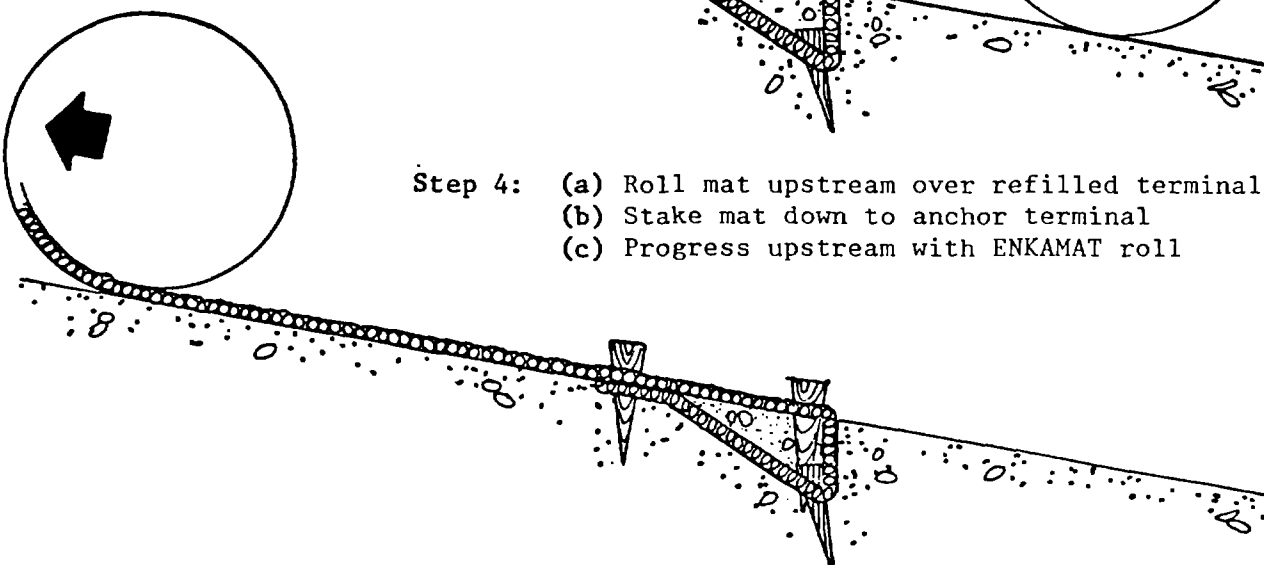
B - INSTALLING ENKAMAT® - STANDARD CHANNEL CONSTRUCTION
